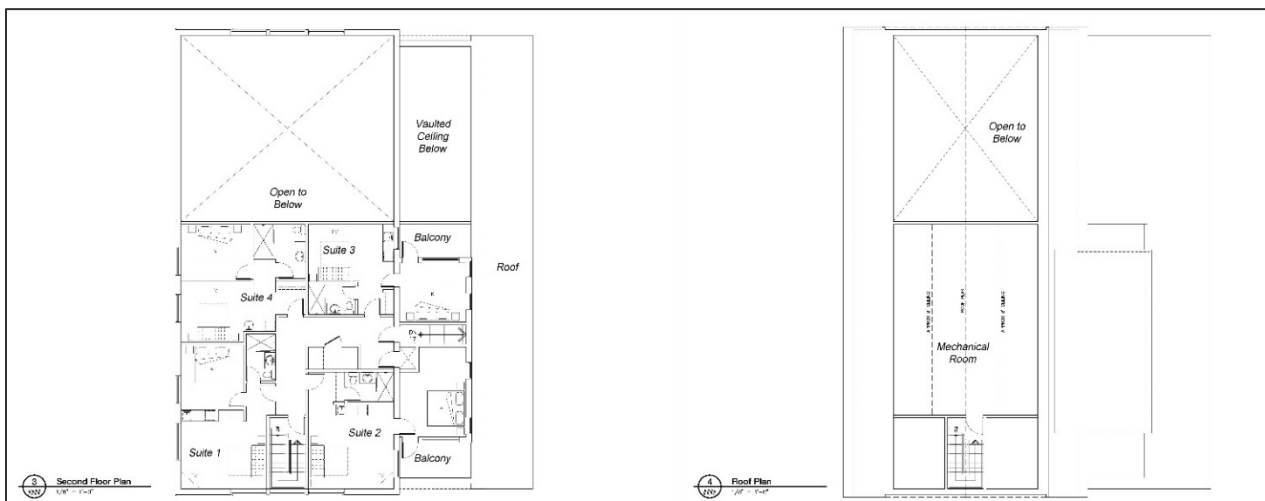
Corporate Event Venue Floor Plans, Second Floor and Roof (source: Shoalts & Zaback Architects).
